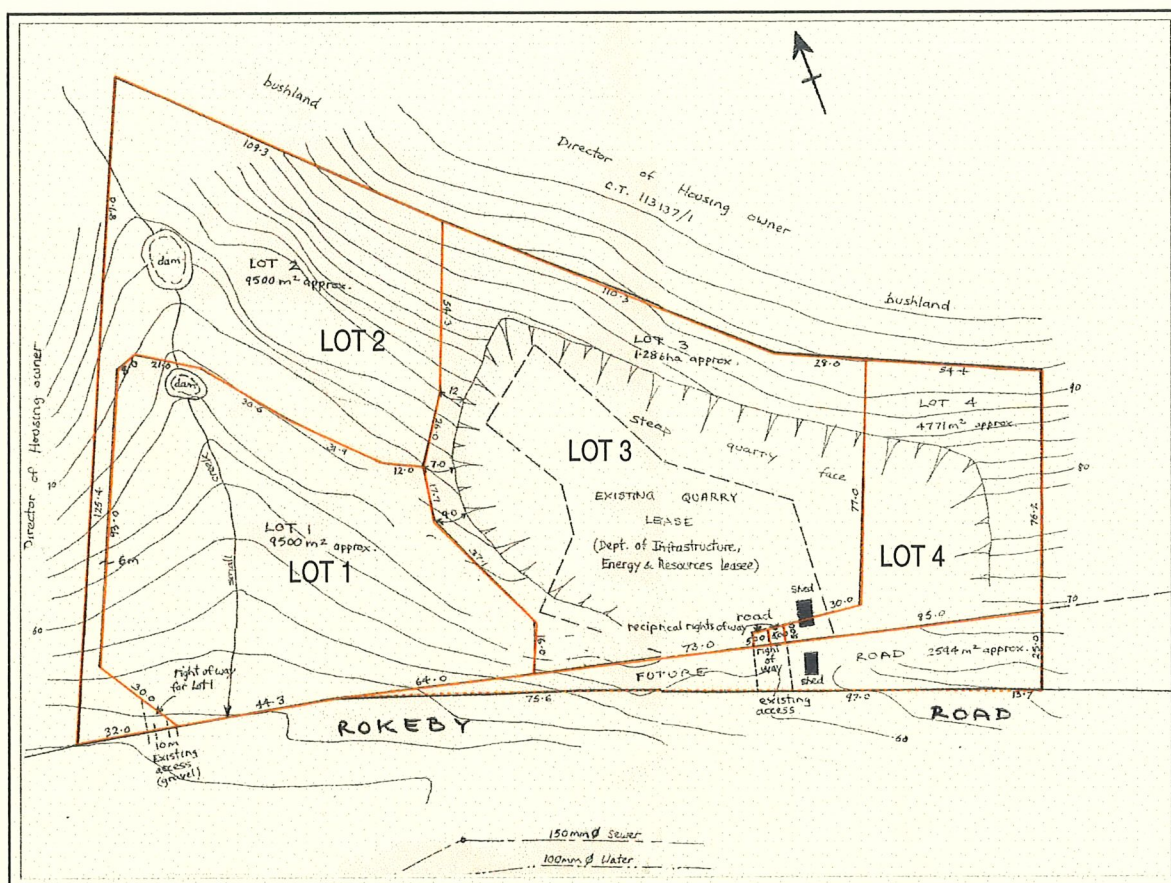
Proposed subdivision layout - 450 Rokeby Road HOWRAH
